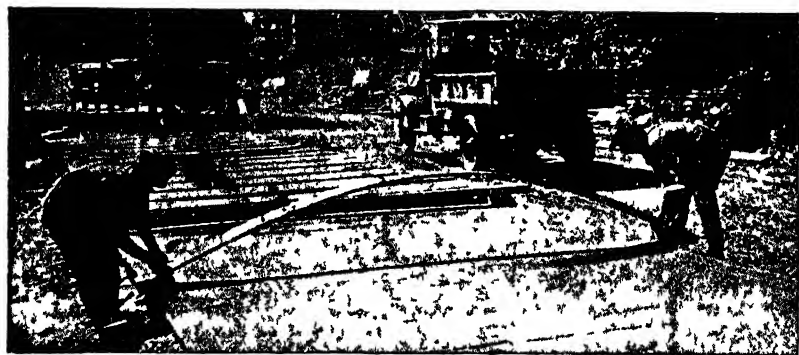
,820 —Finishing concrete pavements 6 Finishing with belt.
